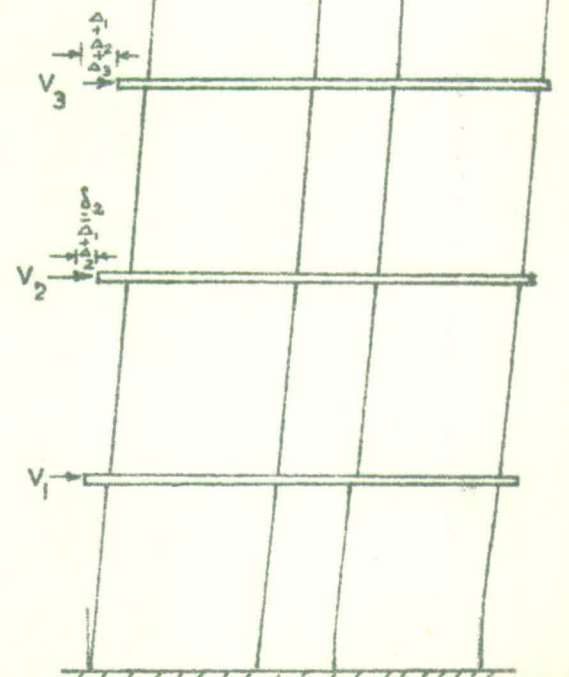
DEFLECTION IN BRICK MULTI-STORY BUILDING
